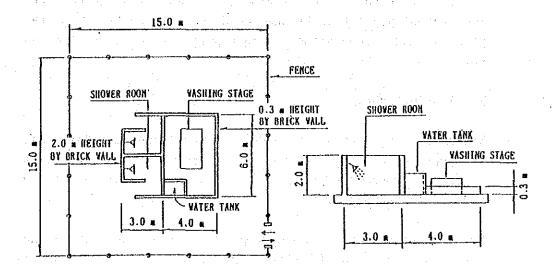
Schematic Plan of Facility of Water Commun Use
